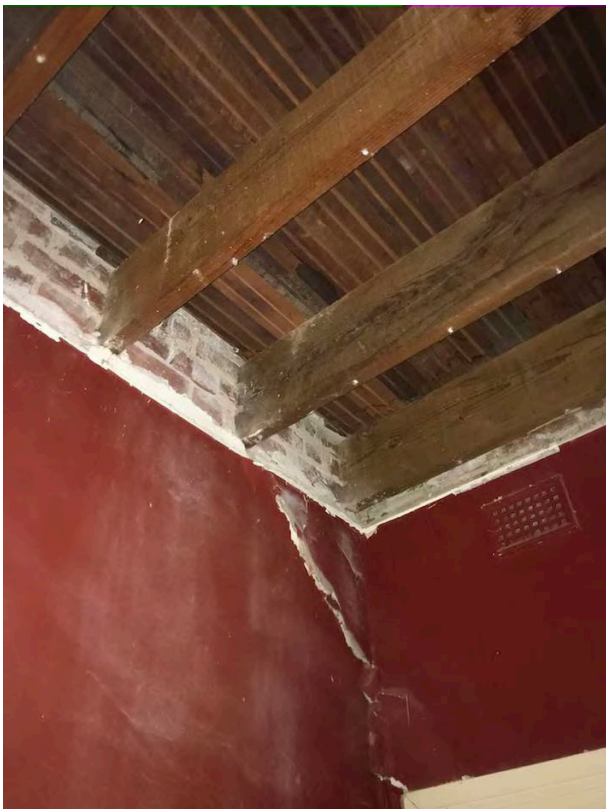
Missing ceilings and cracking and damp to masonry walls of double-storey wing
